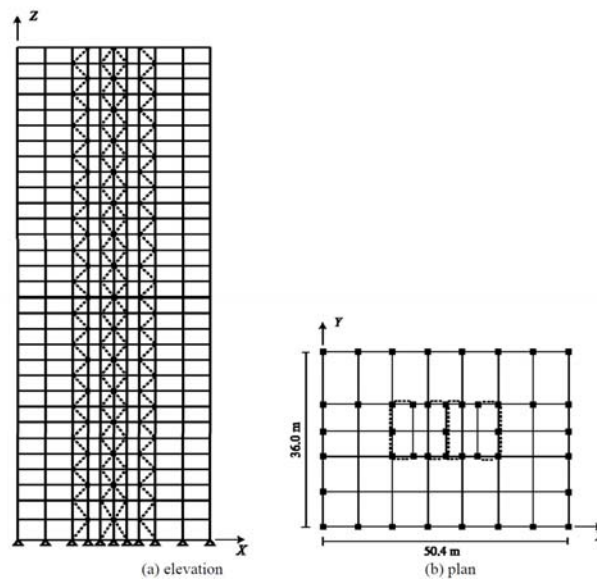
Locations of beams, columns and braces in typical elevation view and floor plan.
